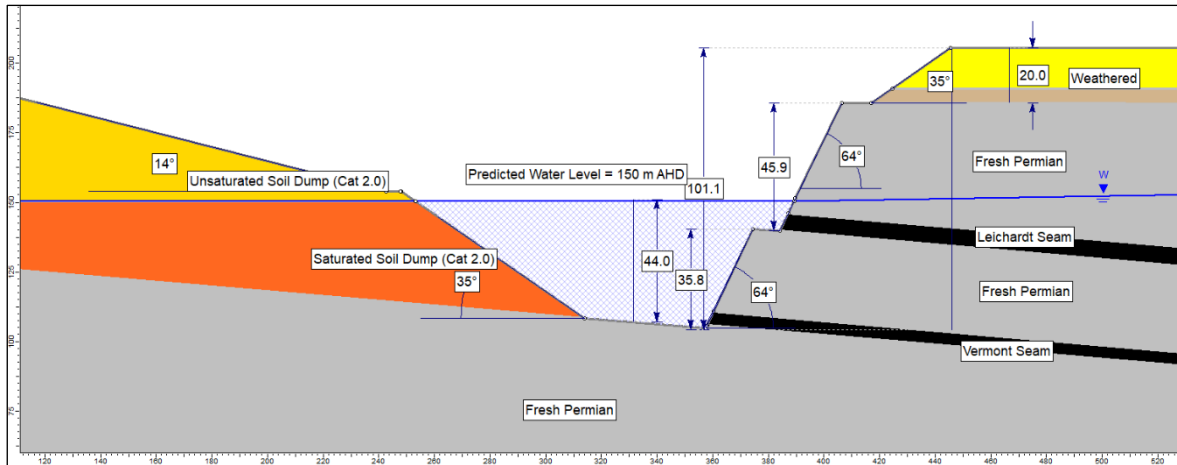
Northern Void (Lowwall and Highwall) – Section 1 (North Facing)
